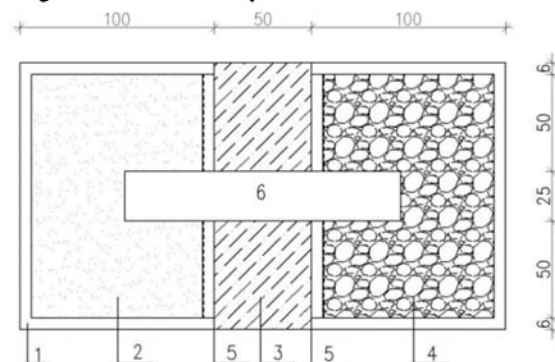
Test wall for field tests 1) underfelt - insulation separating the analysed areas, 2) clinker semi-fitting, 3) clinker fitting with a single-side edge bevelling, 4) clinker roof, 5) concrete moulding, 6) foundation
